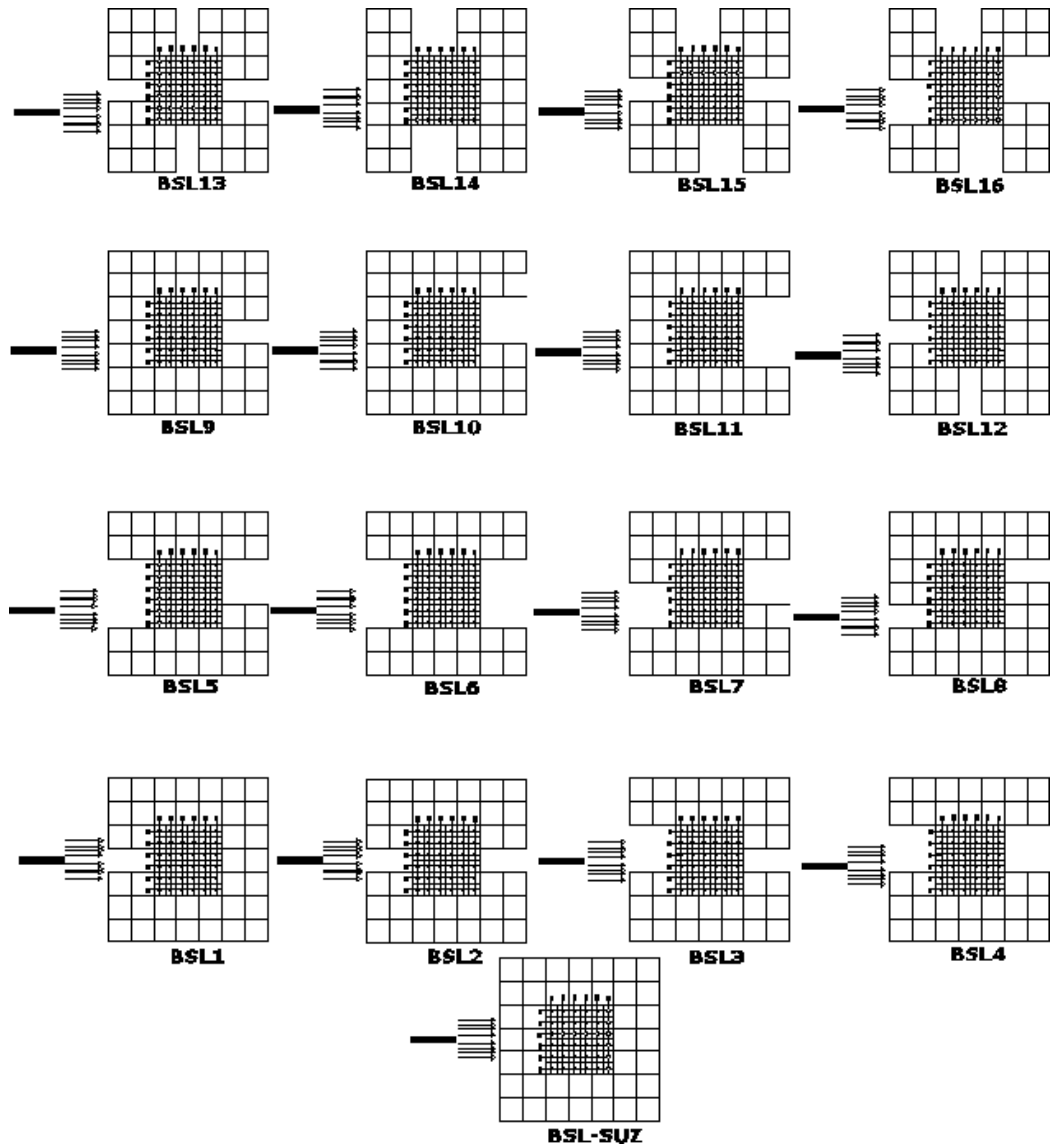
Appearance at ground floor plan level of the configuration for the courtyard with 17 different openings experimented [10].
